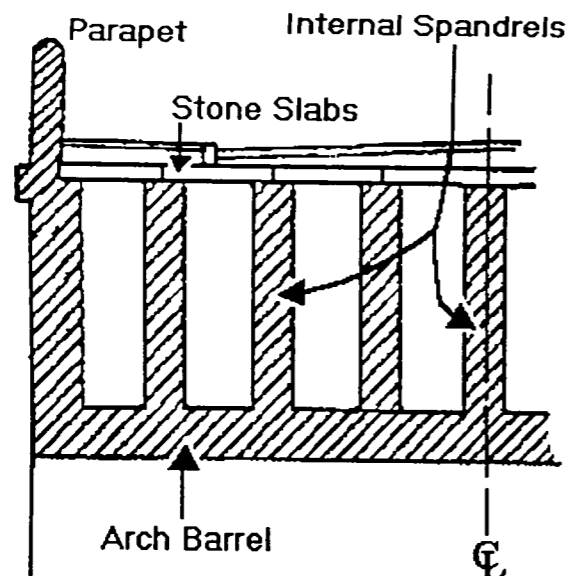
Vertical Section Through Masonry Arch Bridge With Internal Spandrel Walls.
